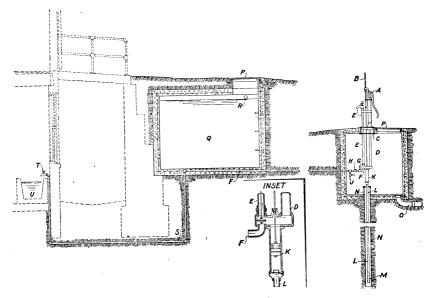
Combined hand and windmill force pump, with underground and surface discharges and storage tank under driveway to second story of barn. A, Pump; B, connecting rod; C, clamp to secure standard to concrete; D, air chamber; E, surface discharge pipe; F, underground discharge pipe; G, relef valve; H, check valve; J, waste and blow-off; K, pump cylinder; L, suction pipe; M, strainer; N, well easing; O, 4-inch drain; P, cast-iron frame and manhole cover; Q, storage tank; R, overnow; S, supply pipe to trough; T, faucet; U, watering trough. Inset shows details of pump cylinder and connections; letters refer as above.
